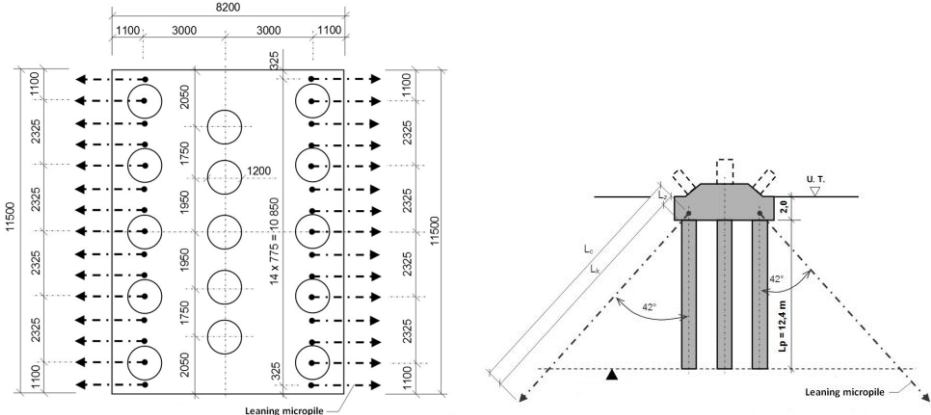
Pillar Nr.7 – suggested arrangement of piles and piles of oblique.
